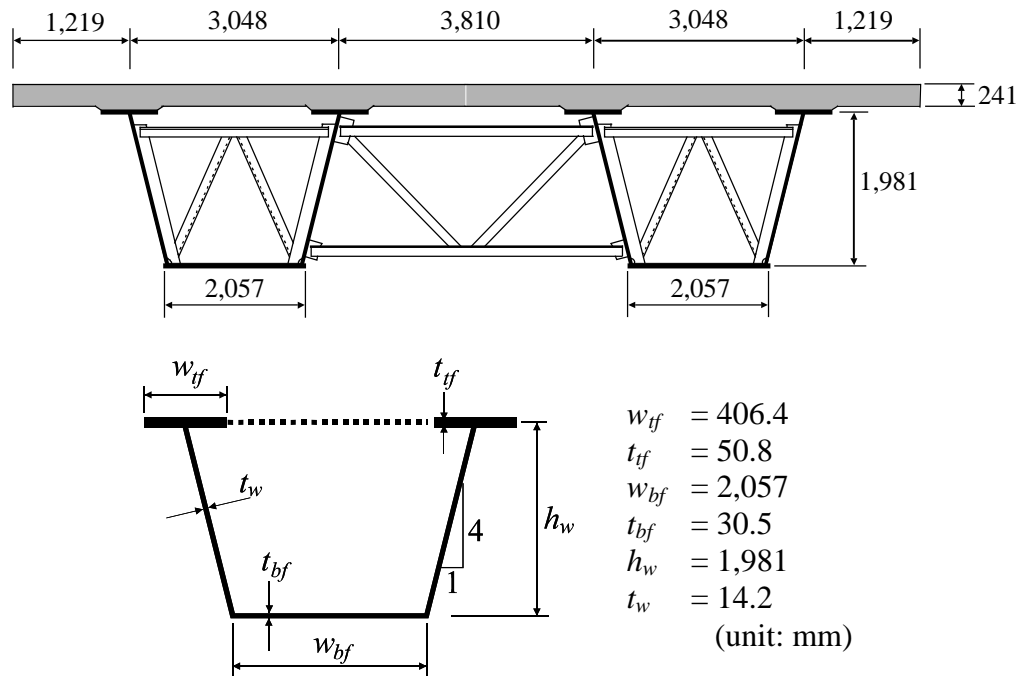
Cross-sectional dimensions of the hypothetical twin-box girder bridge in simple-span
